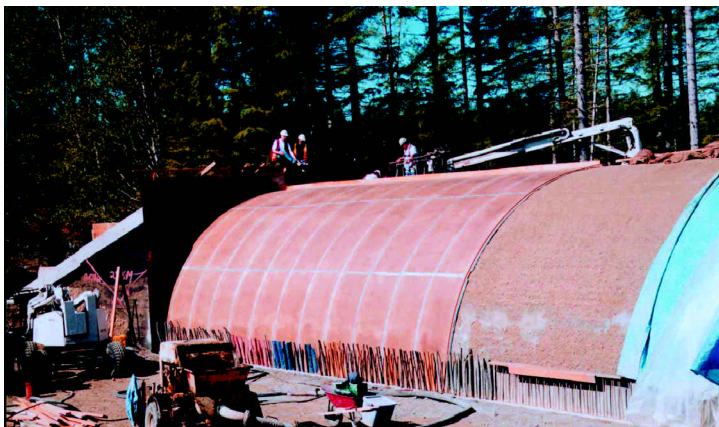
An earth-formed, reinforced shotcrete wildlife underpass being constructed on the Island Highway, Vancouver Island, British Columbia, Canada, as a value-engineering alternative to a corrugated metal structure.
